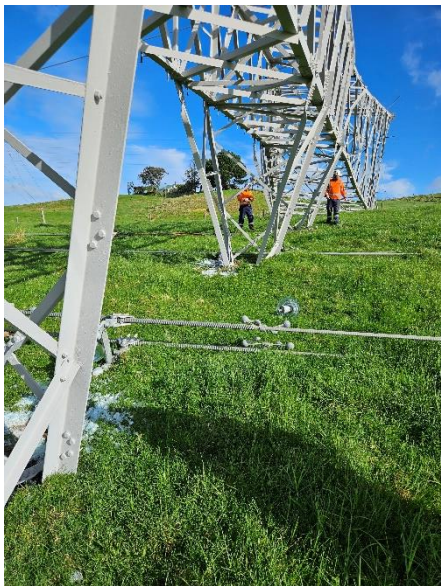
Tower crossarms embedded in the ground from tower fall.
